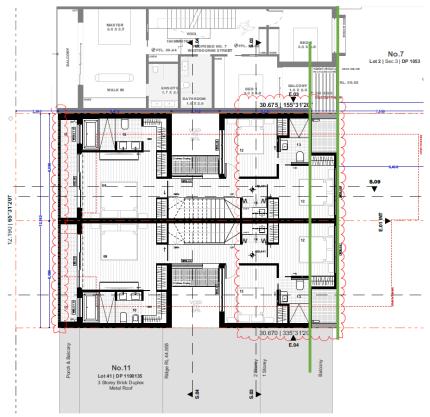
Alignment of the proposed rear of the first floor, in line with No. 7 Westbourne Street.
